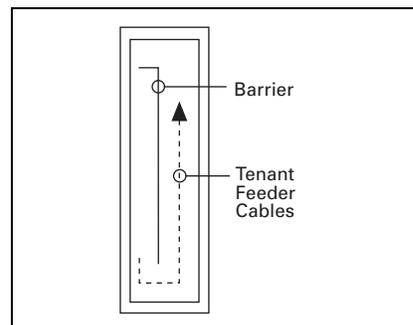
Rear Barried Wireway Metering Section Side View
